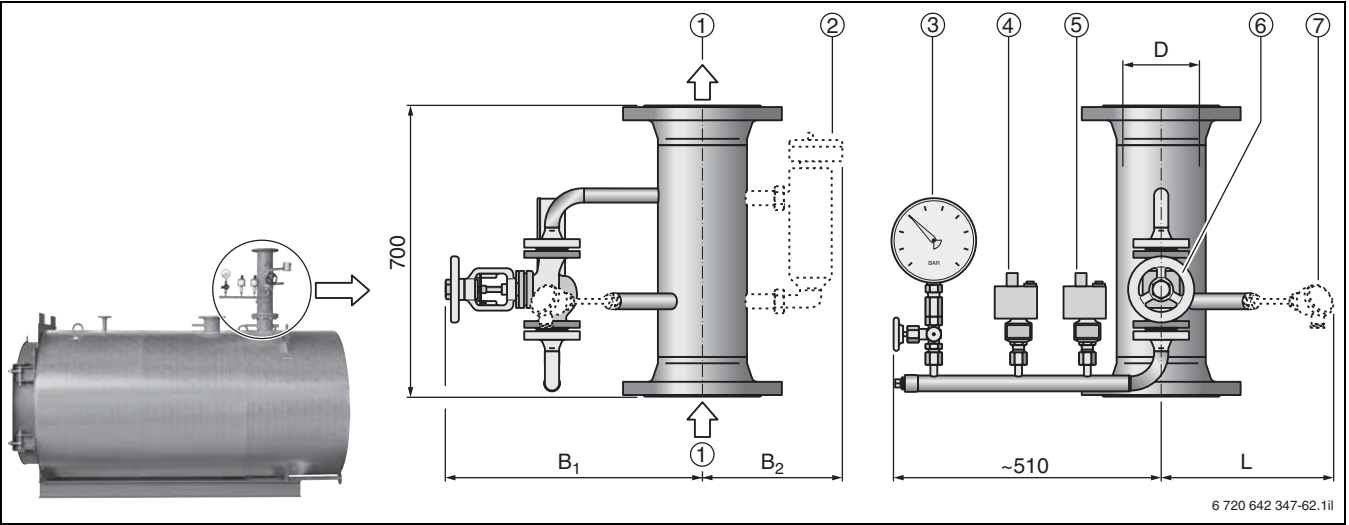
Boiler safety equipment assembly for UNIMAT UT-L boilers (intermediate flow piece with boiler safety assembly and valves; dimensions in mm)
